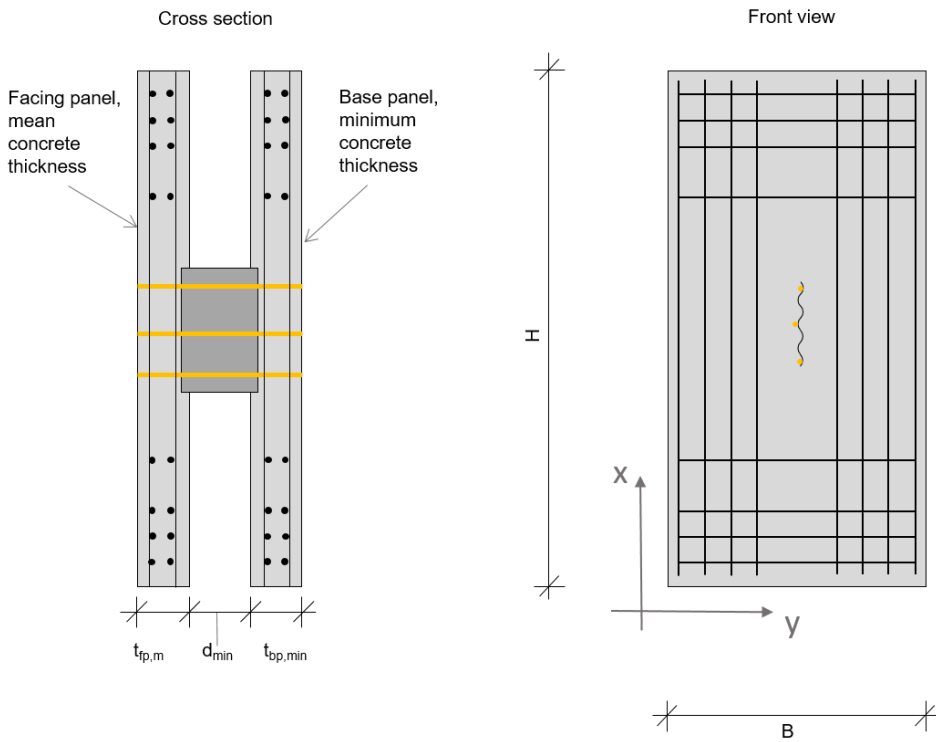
Test specimen – Cyclic shear test in x-direction
